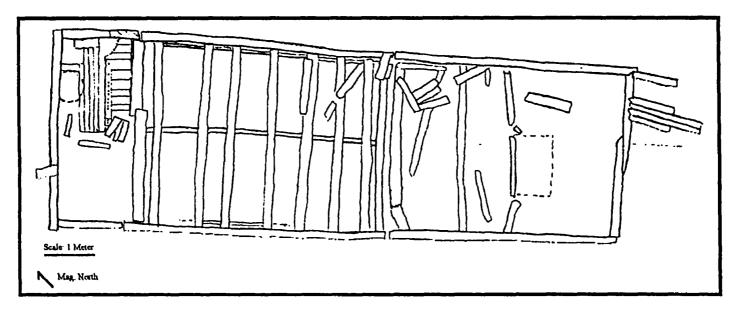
Coldfoot Feature 1, excavated foundation's remaining structural elements.
